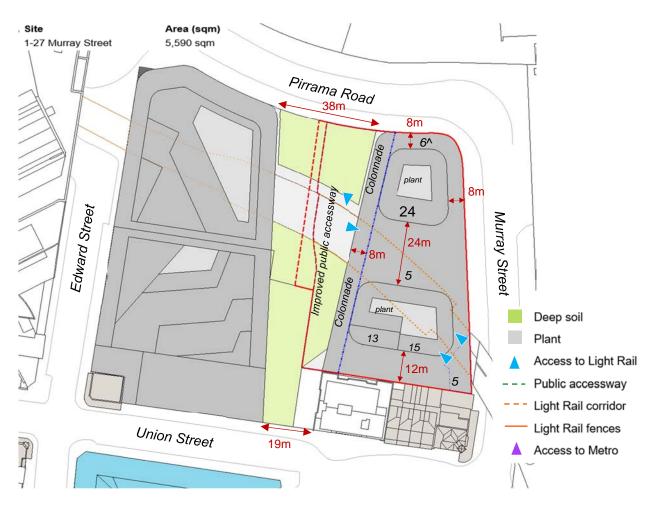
site plan showing proposed controls for mixed use development at 1-27 Murray Street
